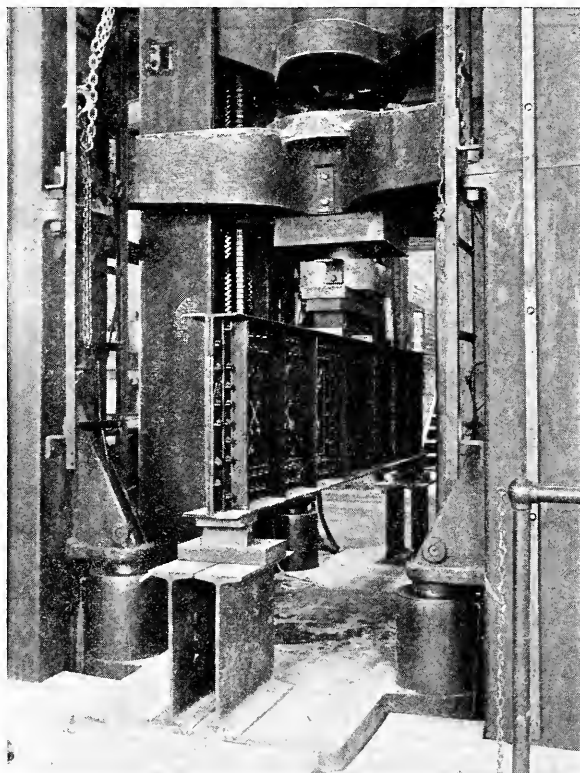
GIRDER IN TESTING MACHINE IN POSITION FOR TESTING
